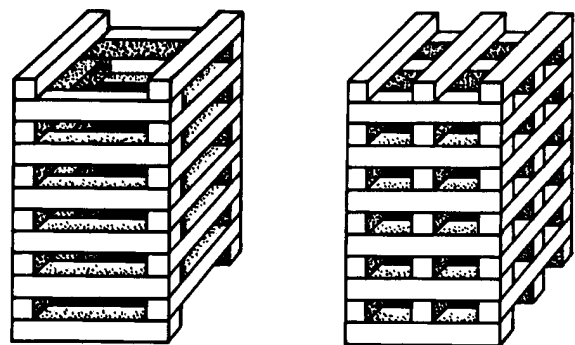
Construction of four-point and nine-point conventional wood crib supports.
